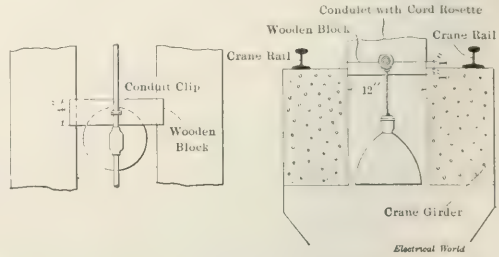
PLAN AND ELEVATION OF FIXTURE SUSPENSION
